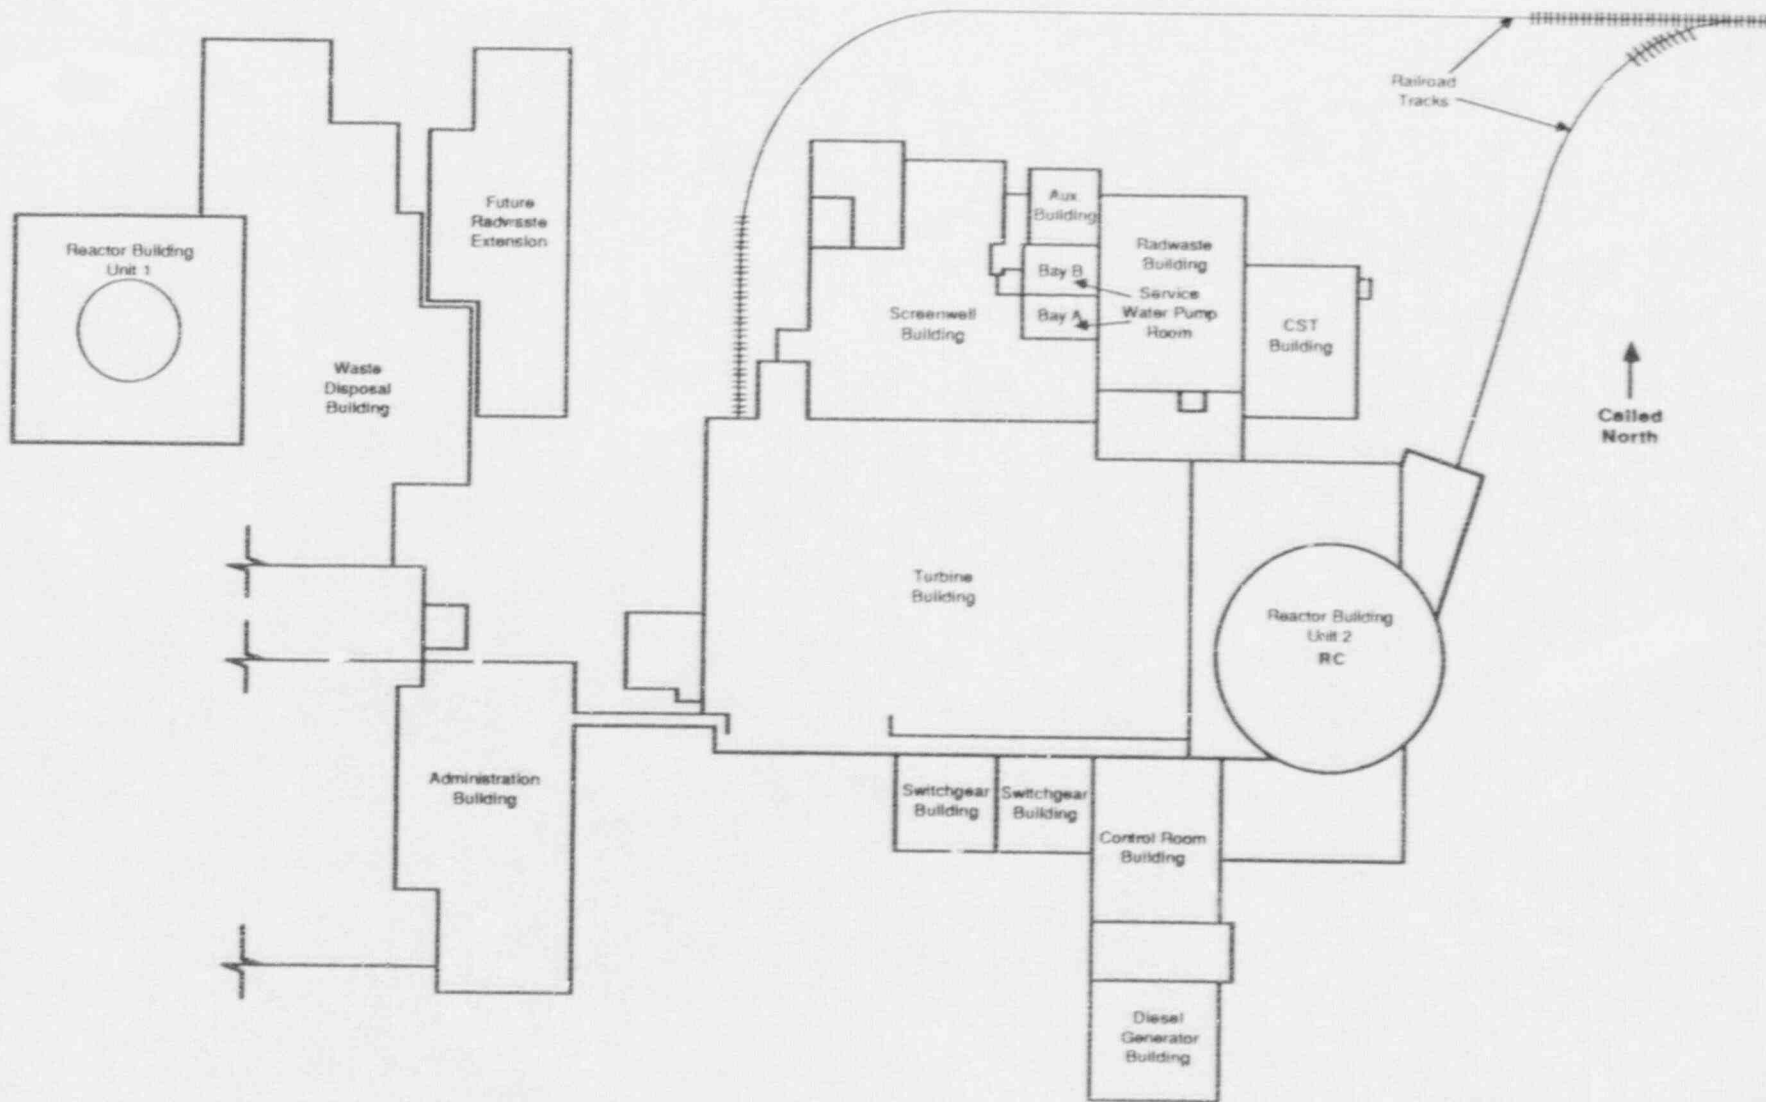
Nine Mile Point 2 Simplified Site Plan
